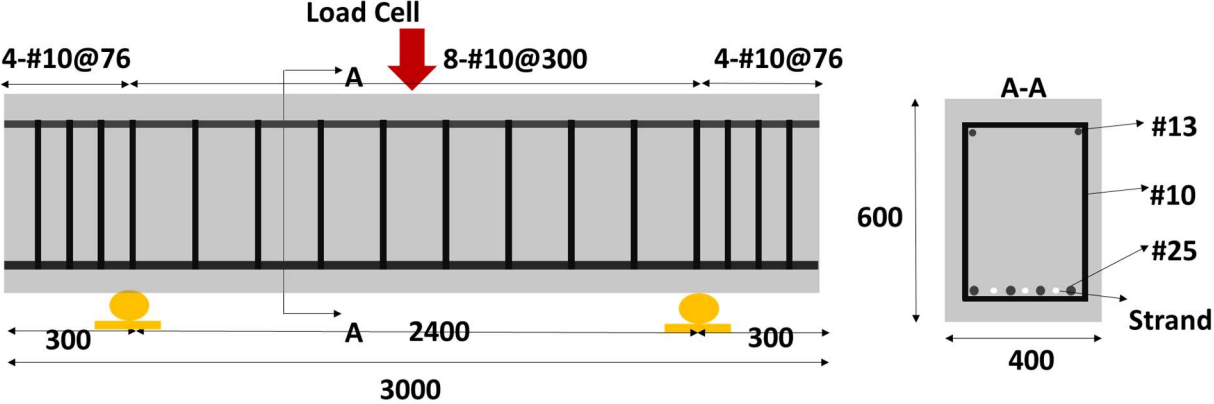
A testing configuration with concrete beam in the second laboratory test.
